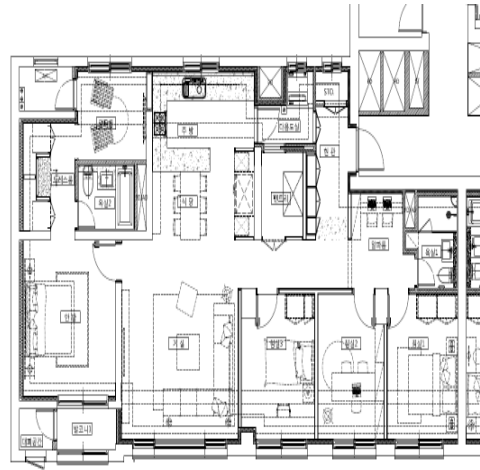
109m² type unit plan for ○○ apartment in Incheon
